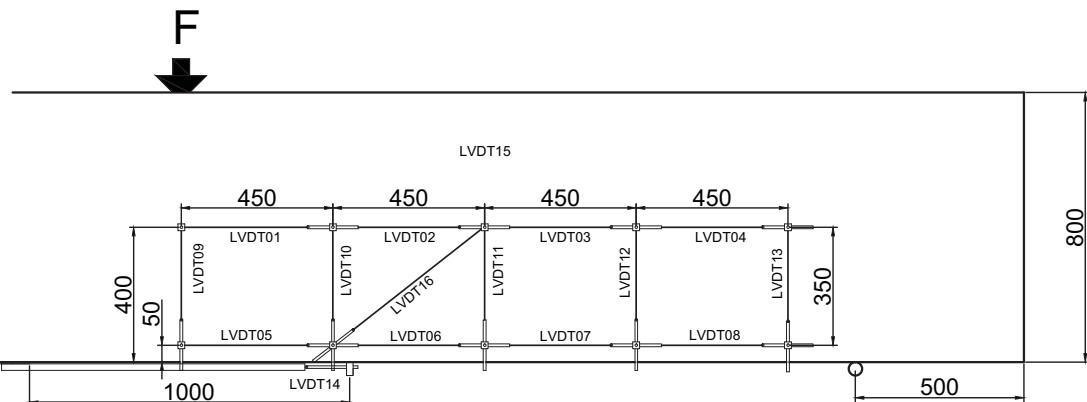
LVDT layout and numbering for 800 mm deep beams
